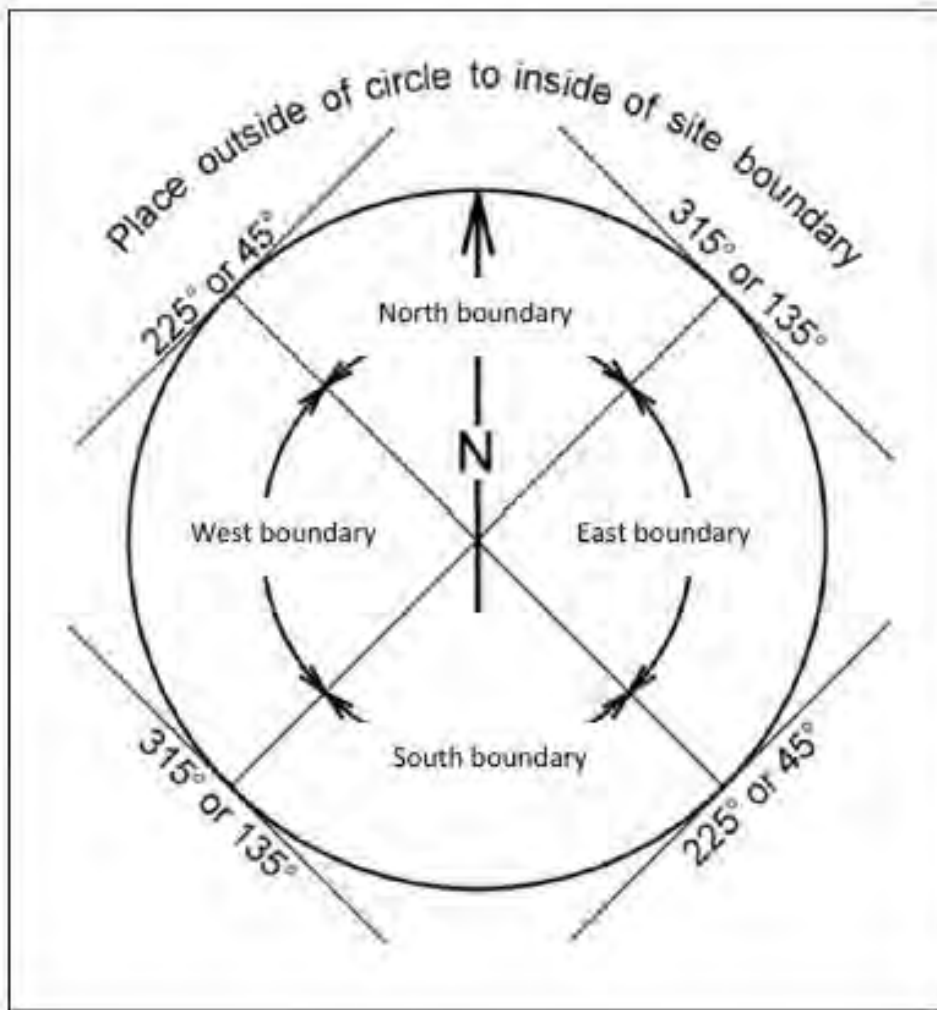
Recession plane indicator for sites adjacent to an open space zone
